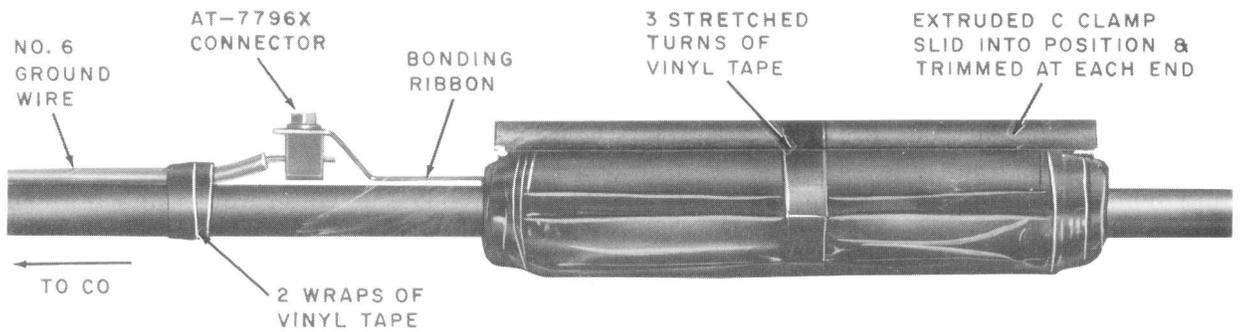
Completed Installation of 9-Type Closure (Grounding)
